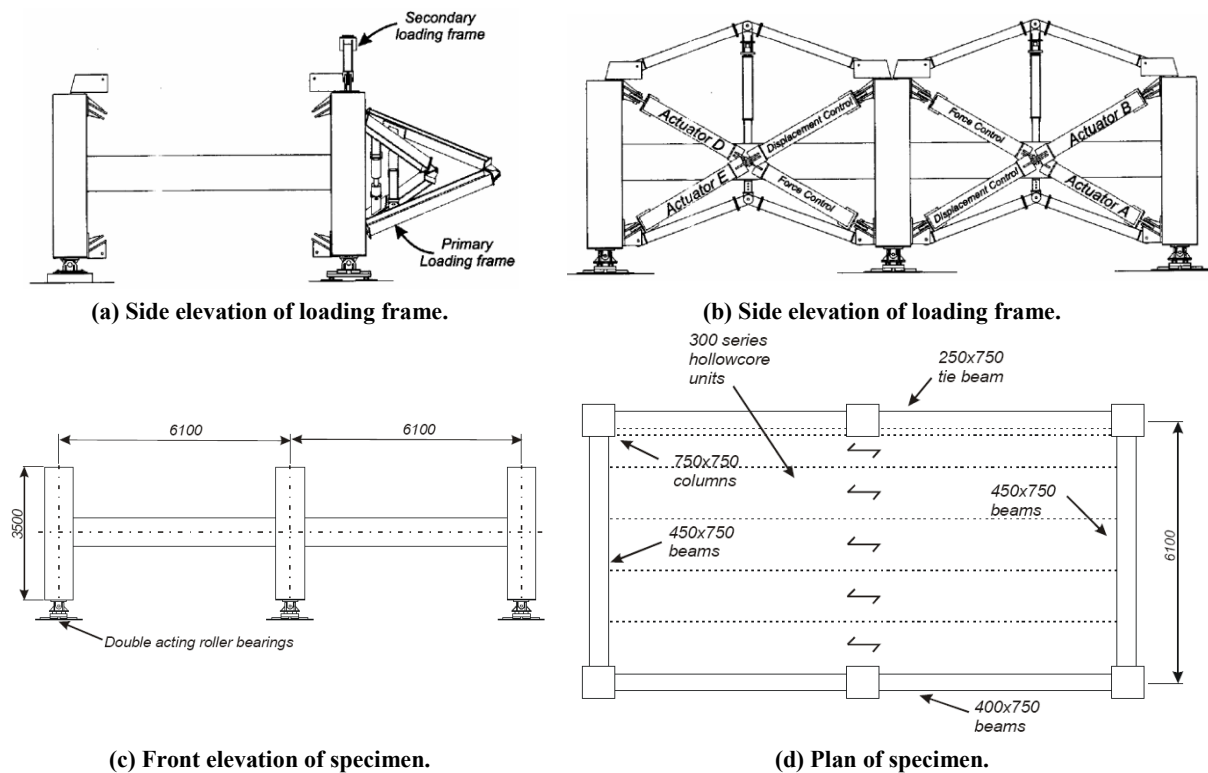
Loading frame and specimen developed and tested by Matthews (2004).
